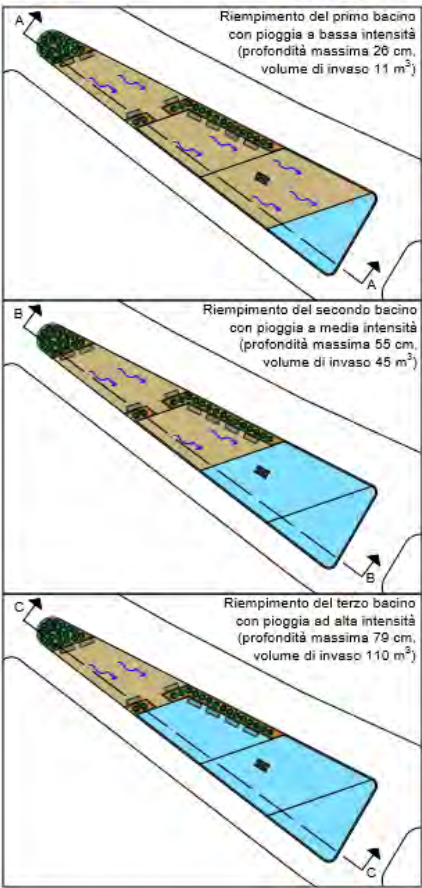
Florence: 'Lungarno Torrigiani' Street and the proposed Rain garden – plan and detail of the rain garden. 'Piazza Martin Lutero' transformed to manage surface water runoff with rain gardens and retention basin.
